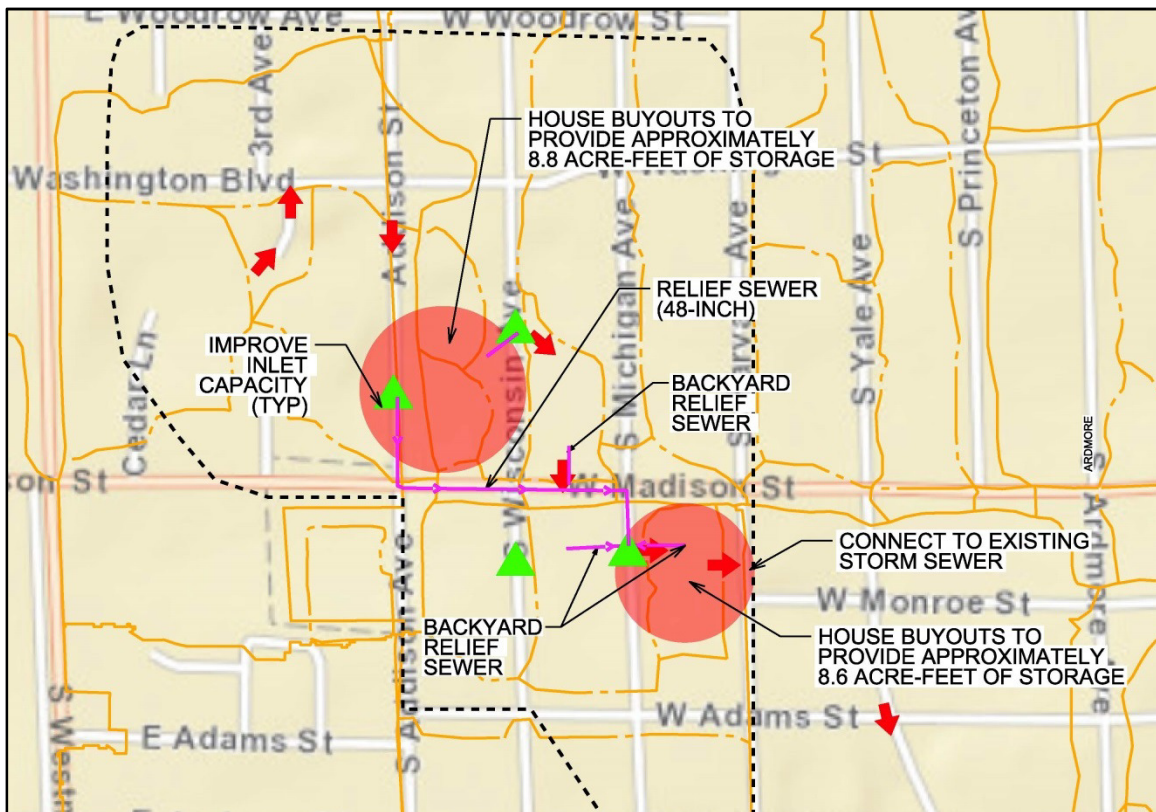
Proposed Improvements for Proposed Alternative 1d
